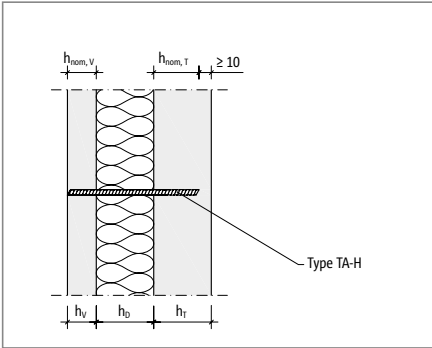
Schöck Isolink® type TA-H: Cross-section details for the sandwich wall;  $h_{nom,V} = h_v$
